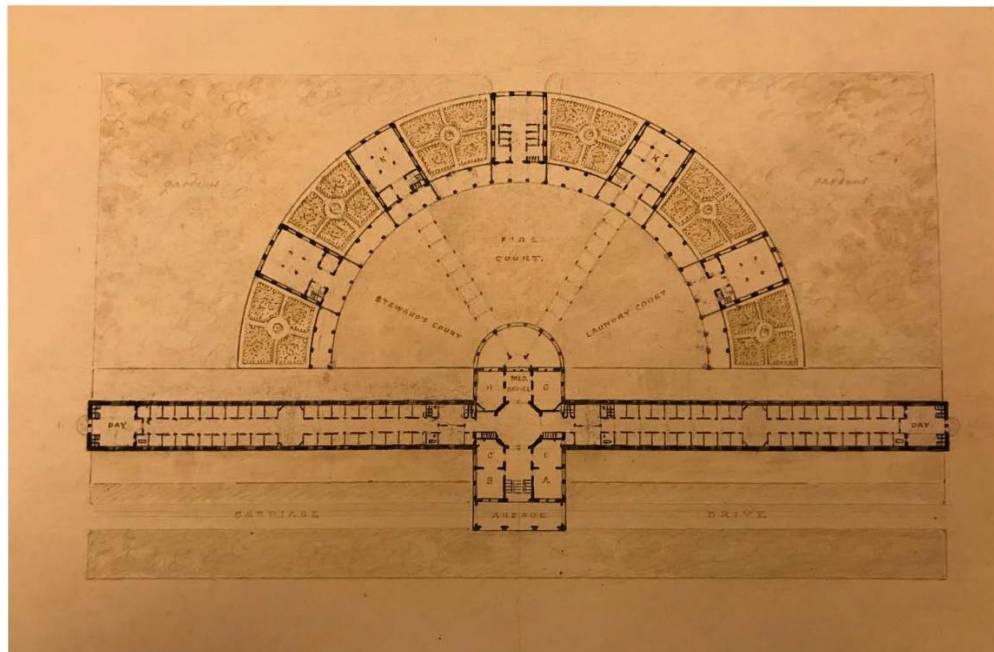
Davis's drawing of plan and landscape treatment of North Carolina Hospital for the Insane, illustrating use of geometry radiating out from the building to compose garden spaces. Gardens provide views from various patient windows and outbuildings between gardens. More naturalistic landscape treatment is suggested beyond these formal semi-circle of parterre gardens. Alexander Jackson Davis Architectural Drawing Collection (1827-1884) New York Historical Society Museum & Library
